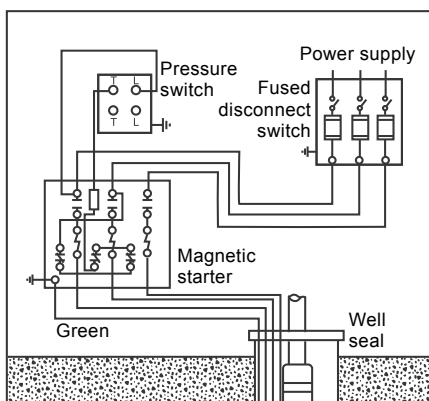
Three-phase wiring diagram for Grundfos motors and other motor manufacturers
